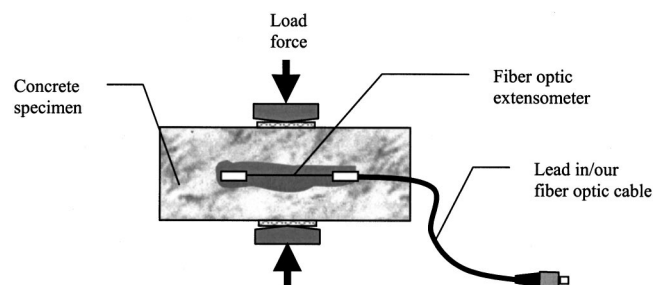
Concrete specimen for splitting tension test with surface mounted fiber gauge.
